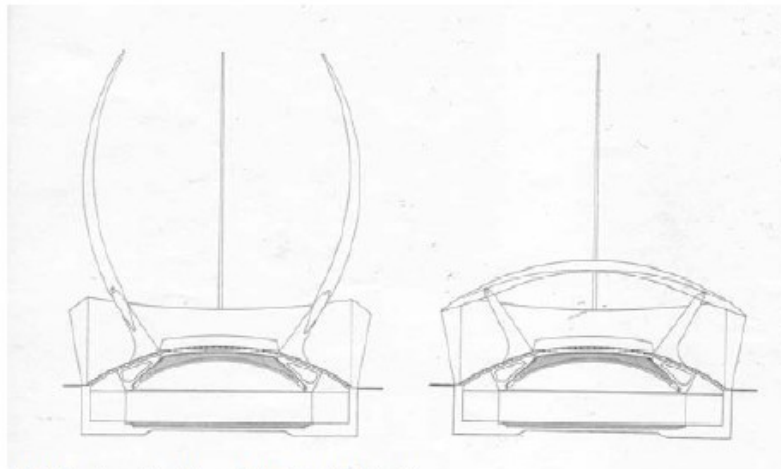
Drawings from Kuwait Pavilion (A. Tzonis)
